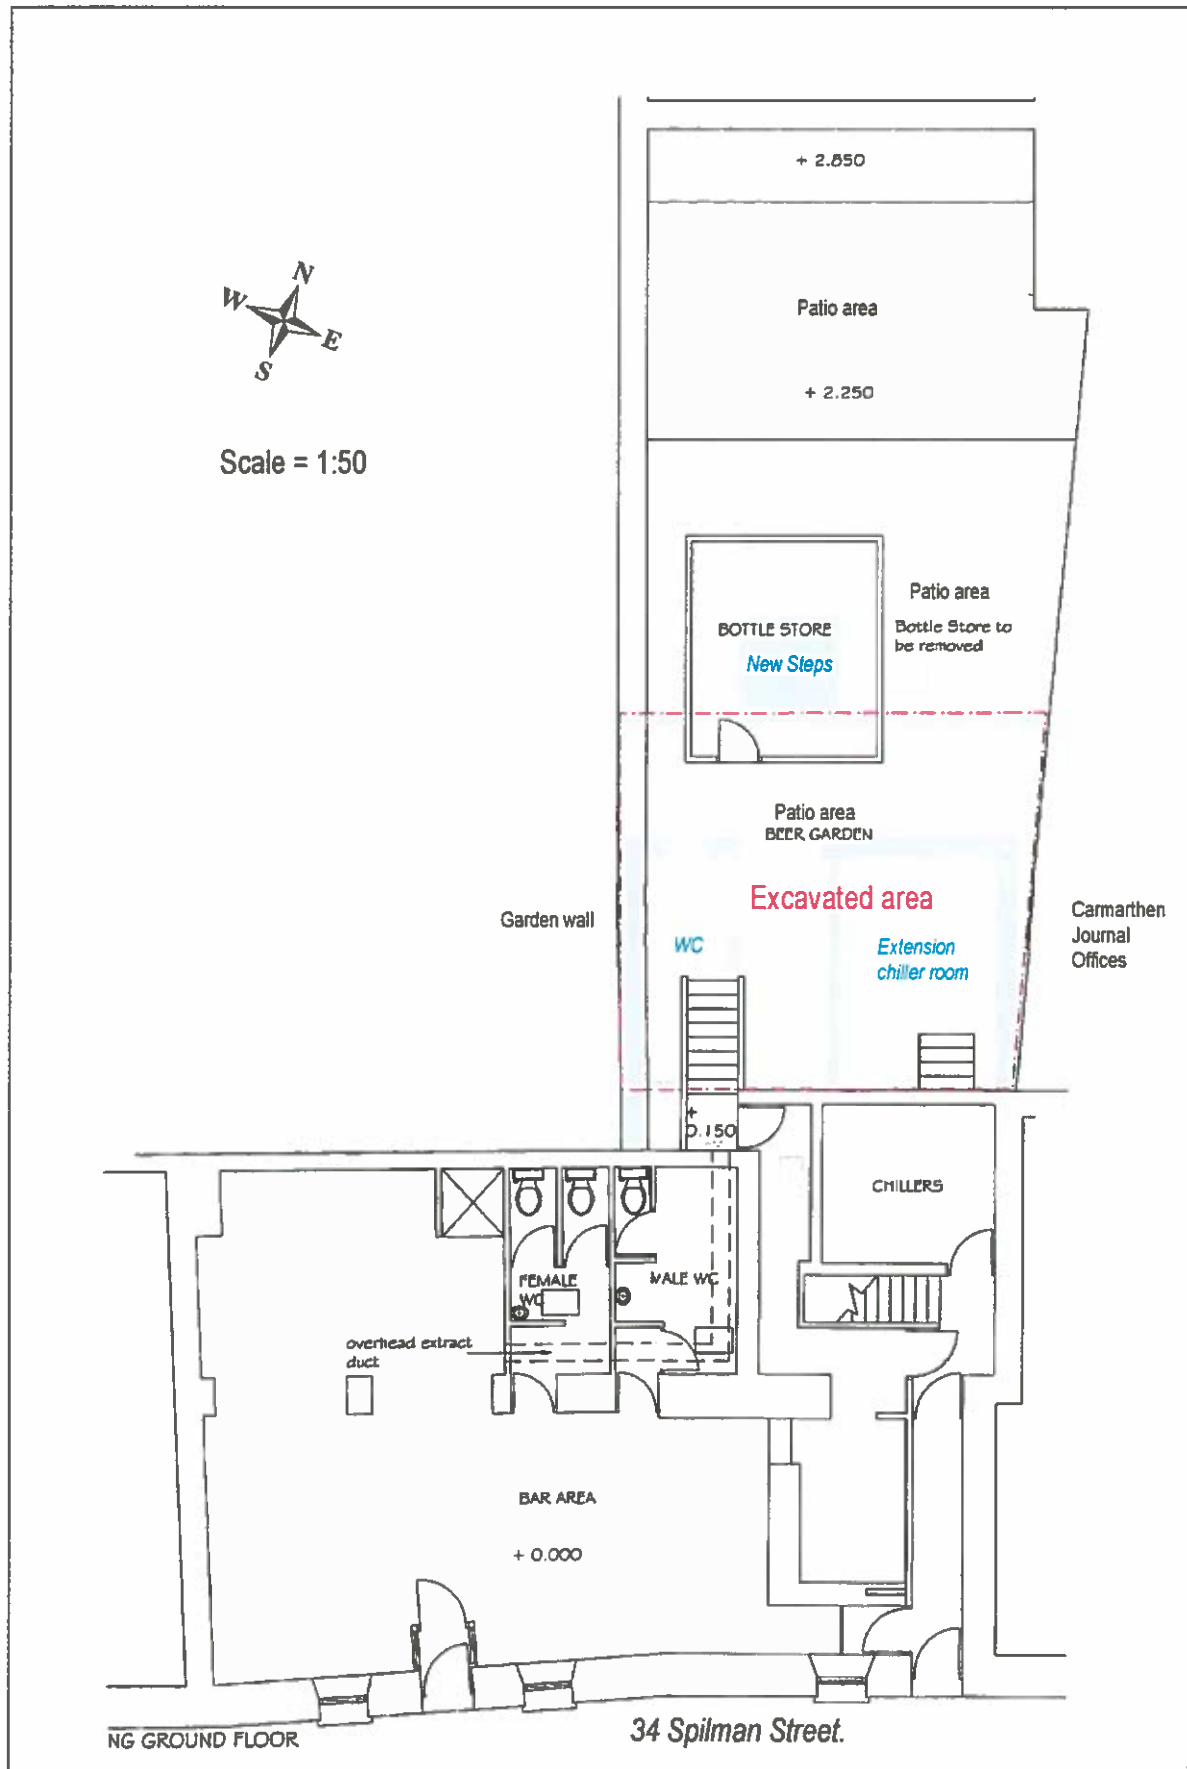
Site plan showing area of excavation outlined in red overlying existing site prior to proposed extension to existing chiller room and steps to raised beer garden level outlined in blue.
